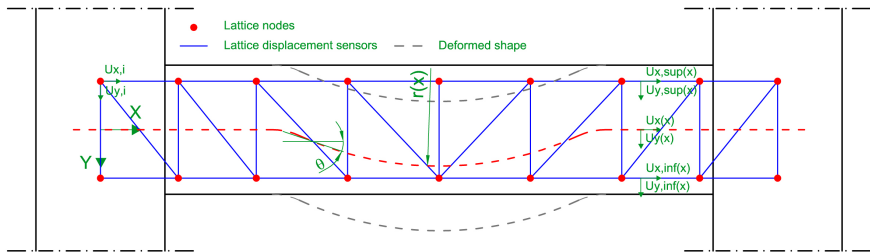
Layout of the LVDT lattice installed on transverse beams.
